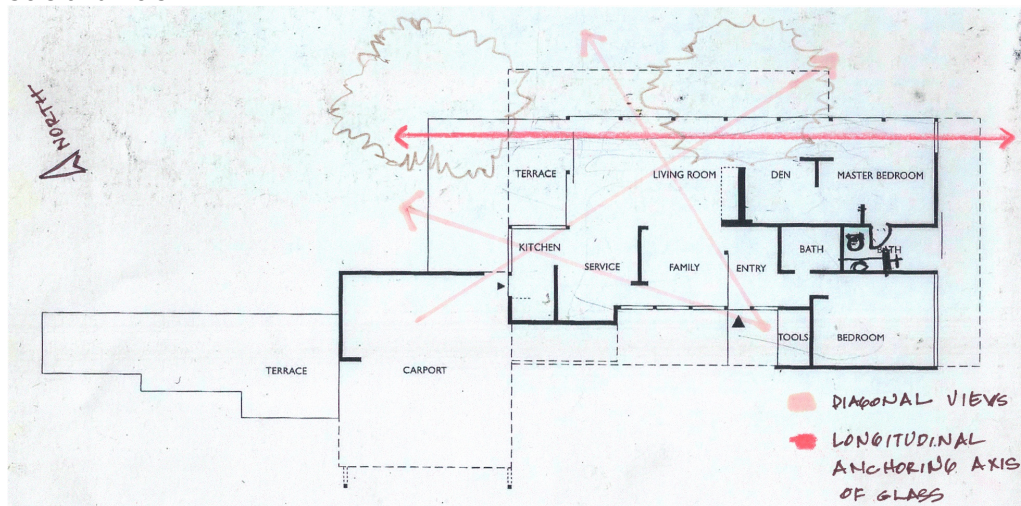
Richard Neutra - Taylor House. floor plan / longitudinal and diagonal axes
